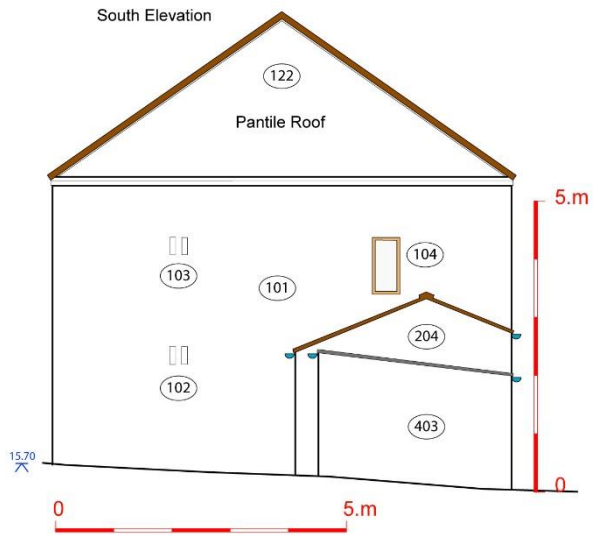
South elevation of the combination Barn, Multi Bay Multi Bay Shelter Shed and Loose Boxes.
